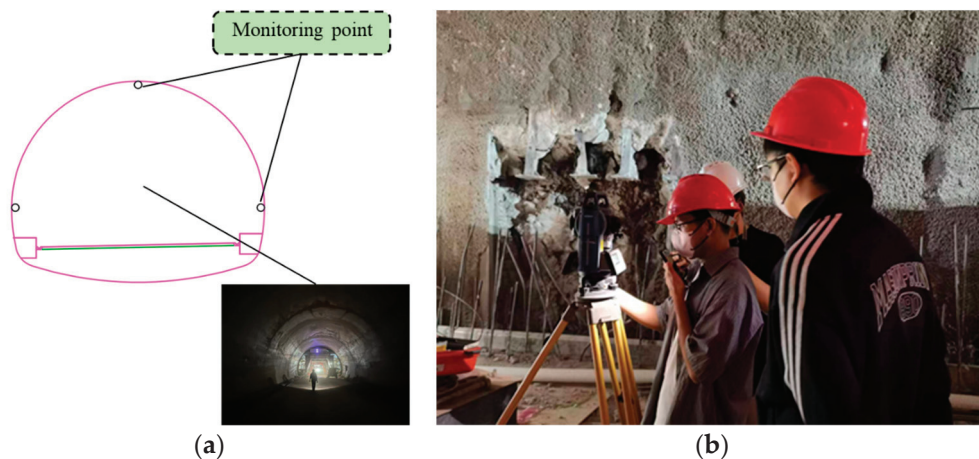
Tunnel deformation monitoring and measurement: (a) tunnel monitoring point layout, (b) manual monitoring and measurement.
